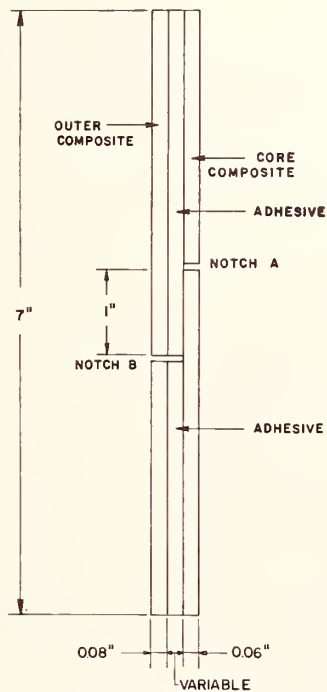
Tensile shear specimen cut from roof or wall panel - System No. 2.
